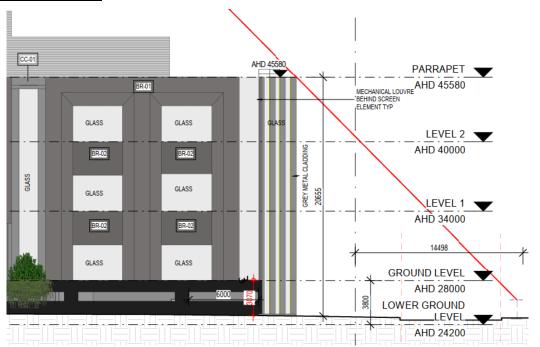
Detail of west elevation (Mcarthur Street) of proposed data centre, with a maximum height dimension of 20.66 metres to Indwe Street.
